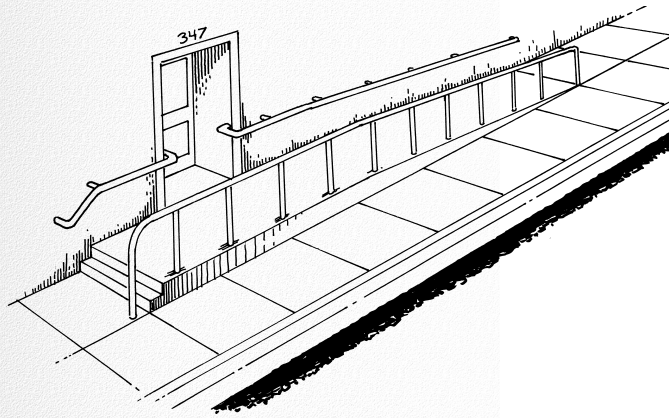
GOOD DESIGN: This sidewalk has been ramped to provide access to the building entrance. This creative design is possible only on wide sidewalks where pedestrians will be given the option to either continue in a straight path or enter the building using the ramp or stairs.
